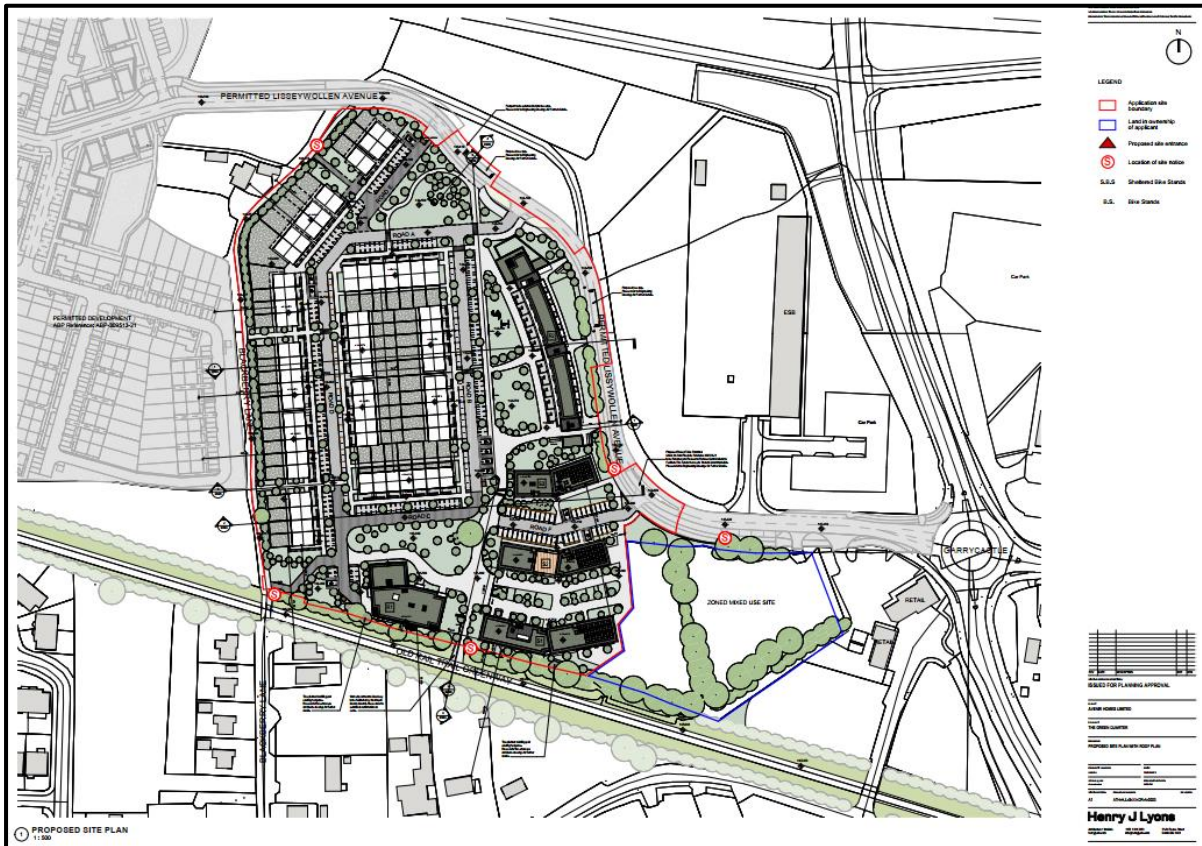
Proposed Site Layout (Source: Henry J Lyons)
